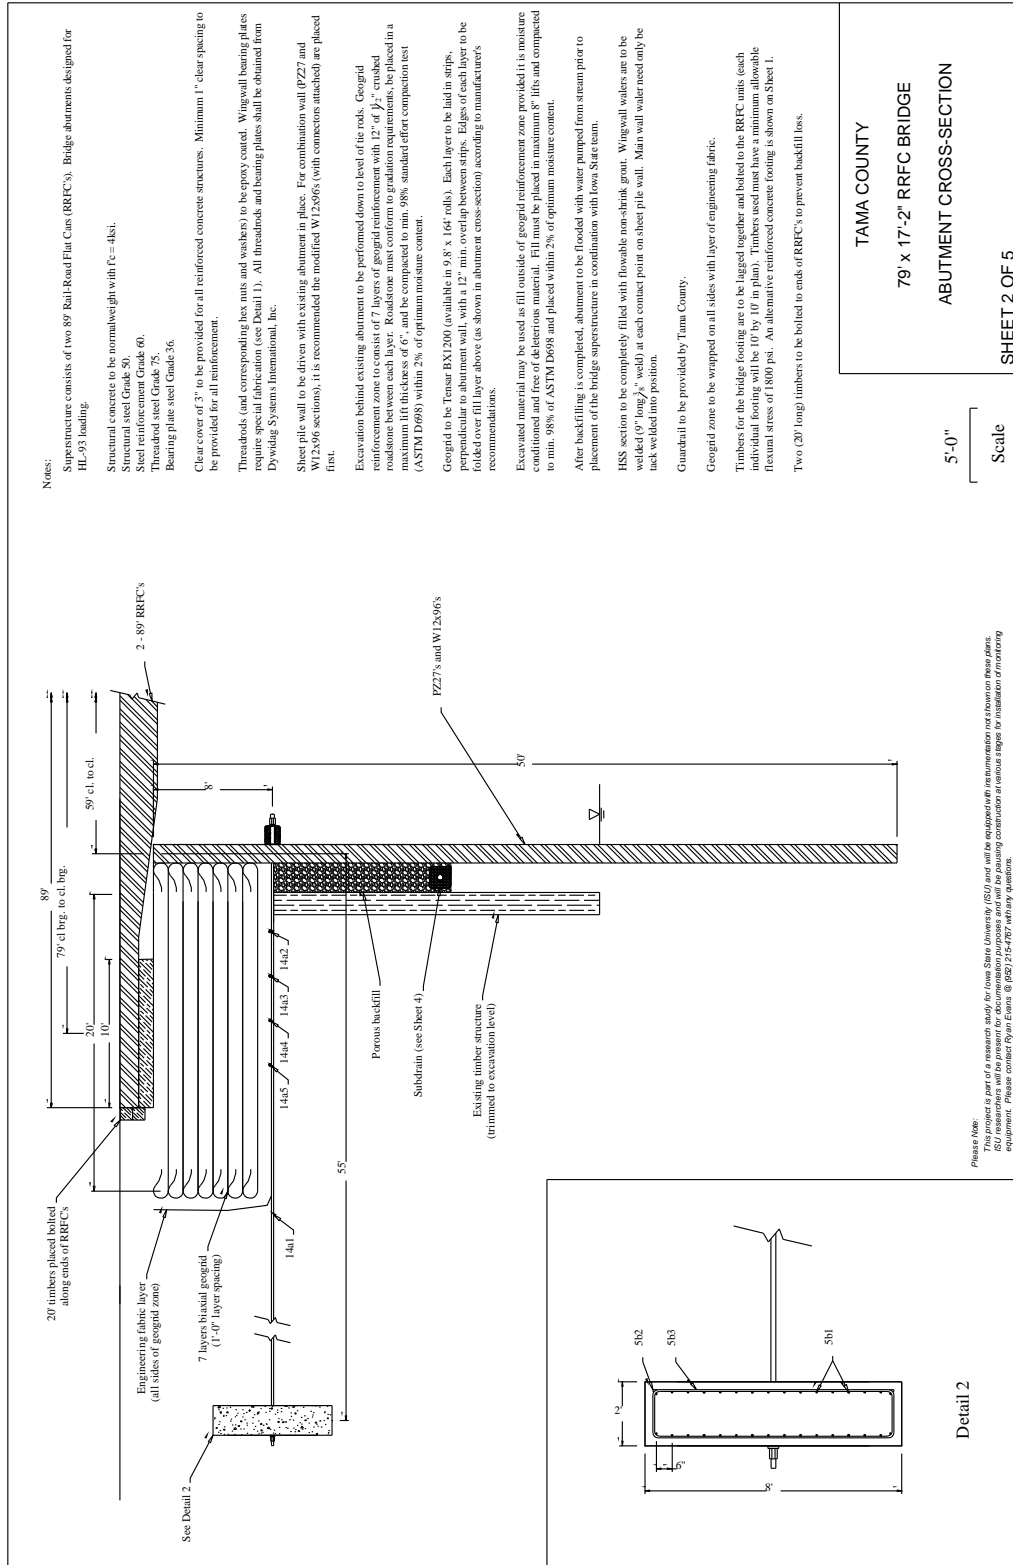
Abutment cross-section (alternative system) for demonstration project in TC, Iowa
